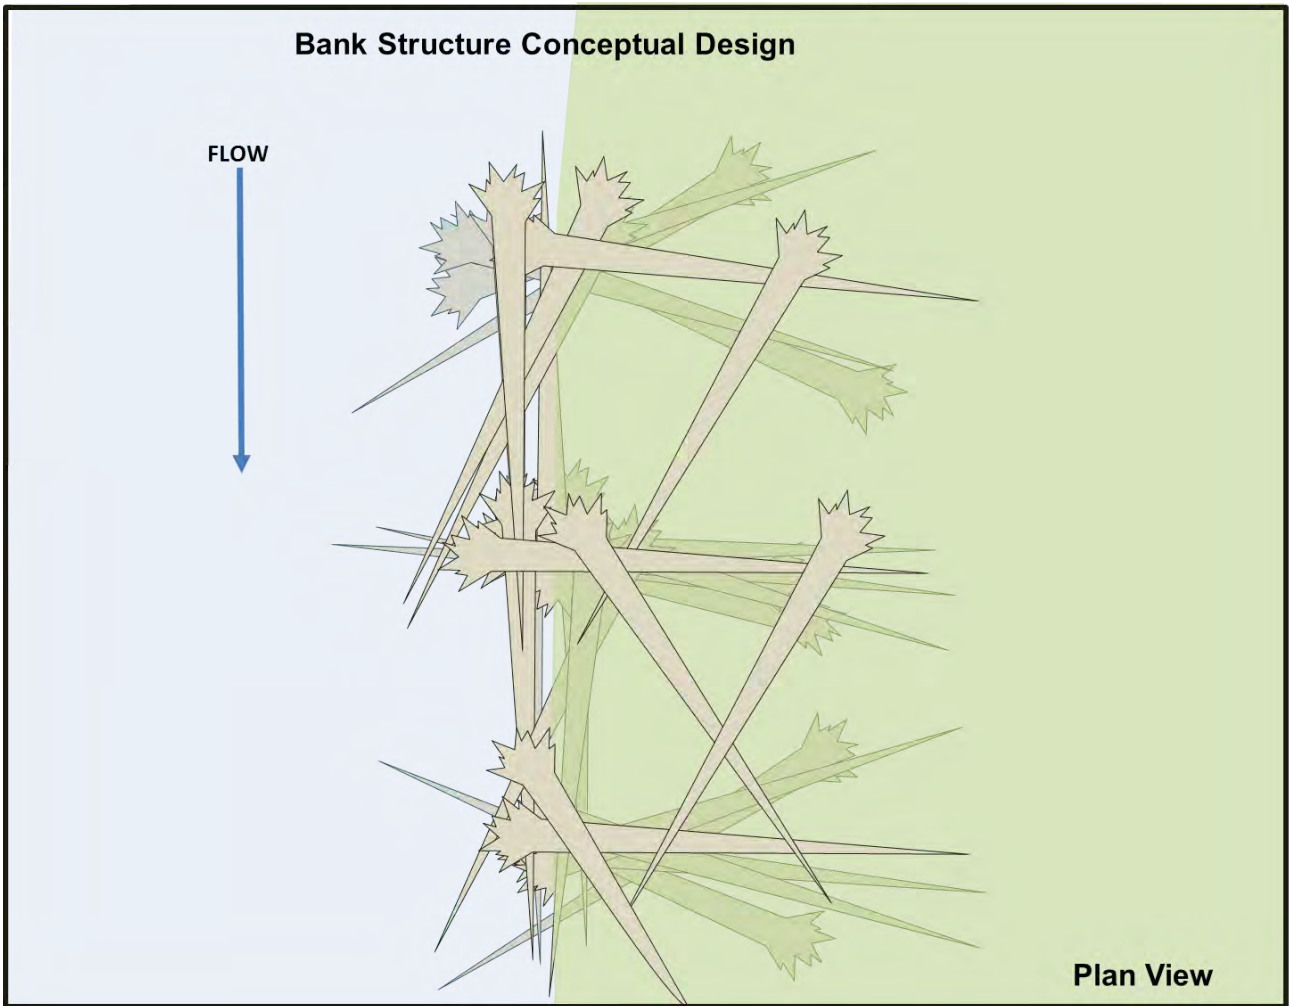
Conceptual plan view design of proposed bank structure key member placement.
